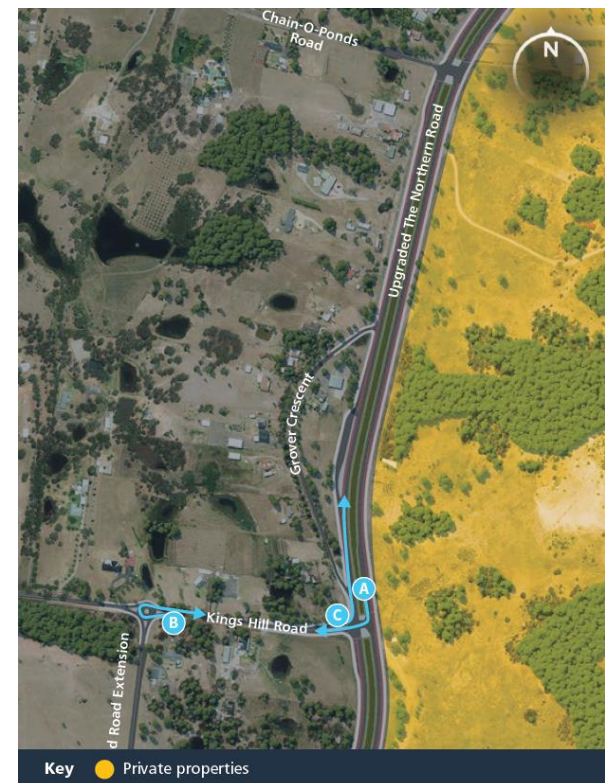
Alternative access arrangements for properties between Kings Hill Road and Chain-O-Ponds Road
